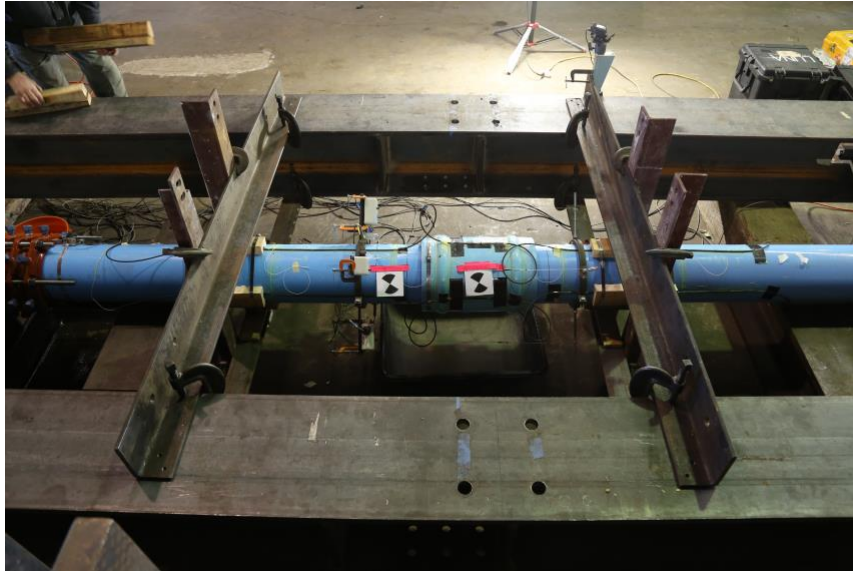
Photo of the experimental setup and the test specimen during the test: a side view
